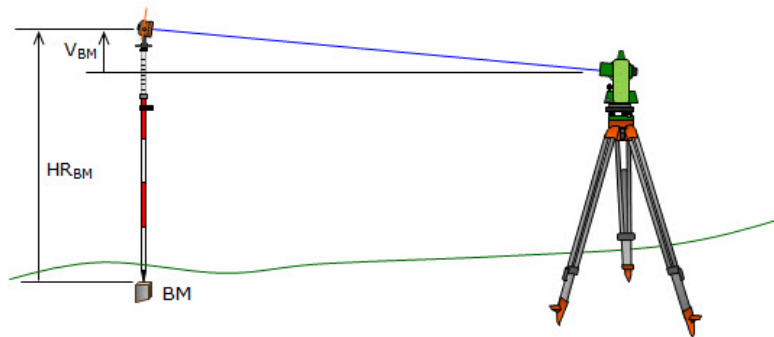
Remote Elevation - instrument elevation from known benchmark (jerrymahun.com)
